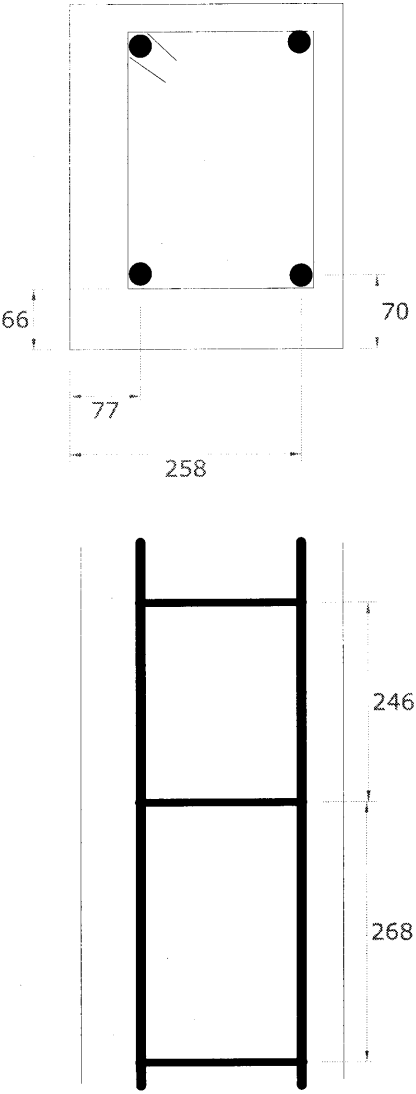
(b) Marking of column reinforcement at the ground floor of Titumir hall.
